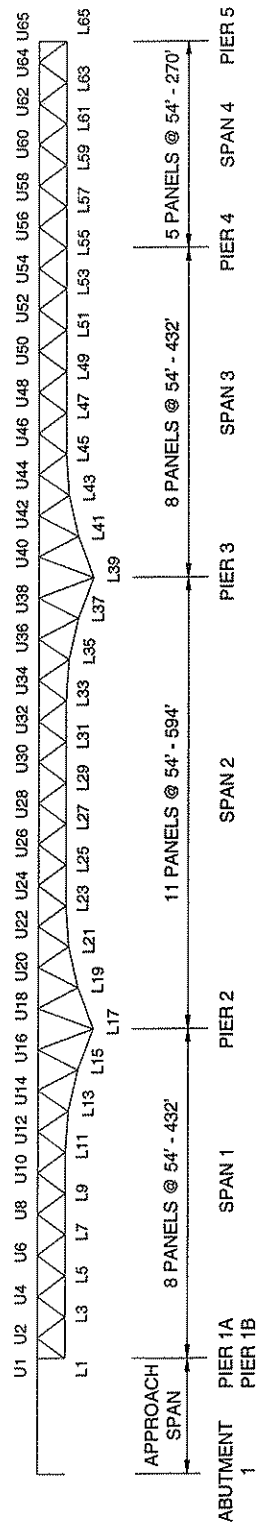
Elevation drawing of the SR33 Lehigh River Bridge looking west.
